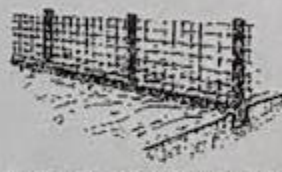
Constructing a silt fence to slow runoff and prevent erosion.
